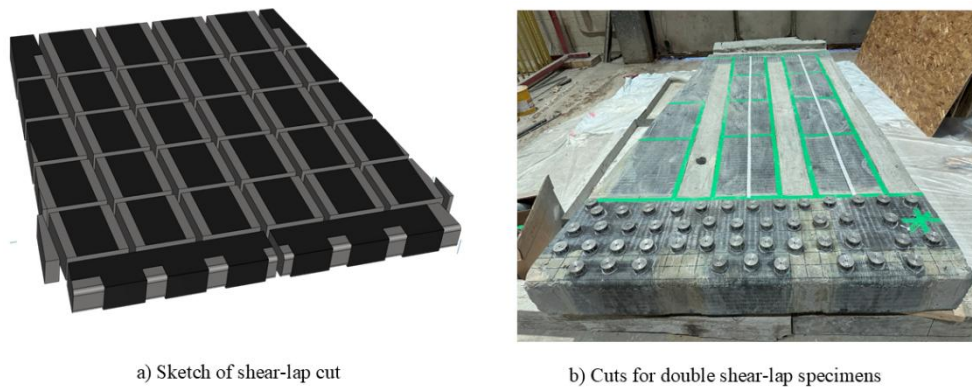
Shear-lap sample extracting from bridge diaphragm
